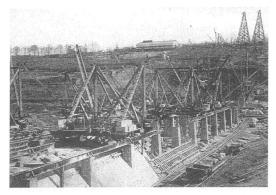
Construction of Kensico Dam. Arrangement of derricks and cableway towers. (USA)
